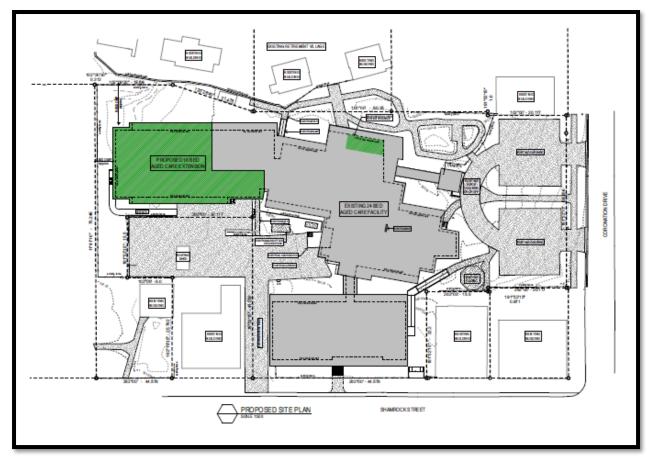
PROPOSED SITE PLAN (Source: Extract from approved plans)
